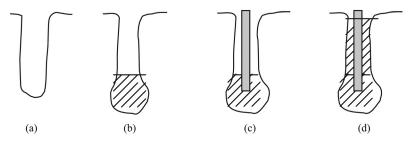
Precast piles with grouted base installation. (a) Augur a hole. (b) Grout the base under pressure. (c) Insert the precast pile. (d) Grout the annulus of the hole.
